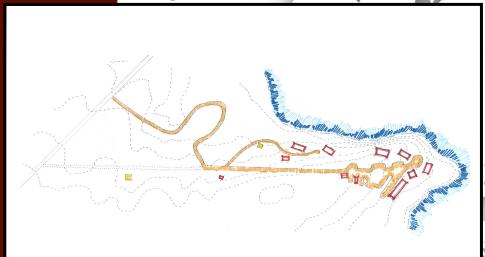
Site Map- Roads and Buildings (Schlukebier 2004)
